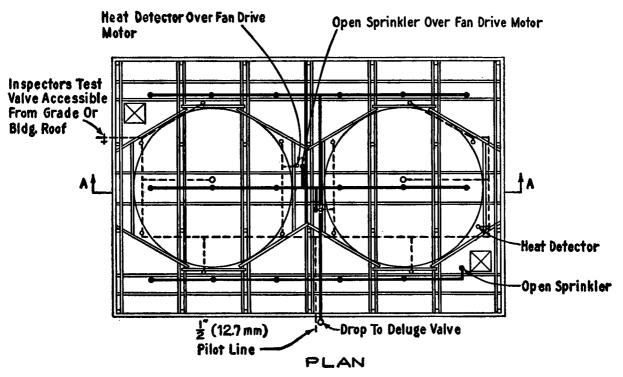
Typical deluge fire protection arrangement for counterflow towers.
